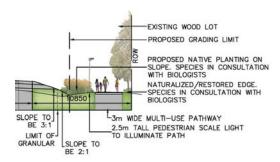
Typical Section Through 3.0 m Wide Multi-Use Pathway
